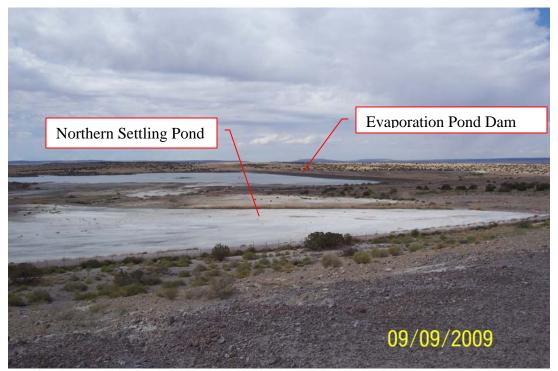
View from Ash Landfill area towards settling pond and Evaporation Pond Dam. Note small earthen berm around northern settling pond.
